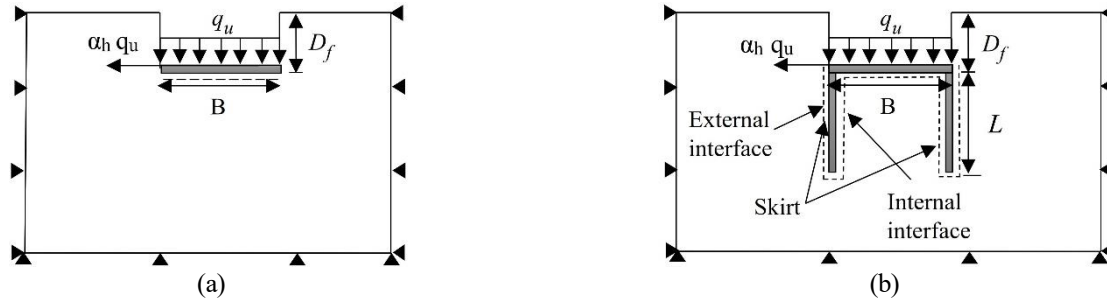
Typical footings: (a) Strip footing and (b) Skirted footing
